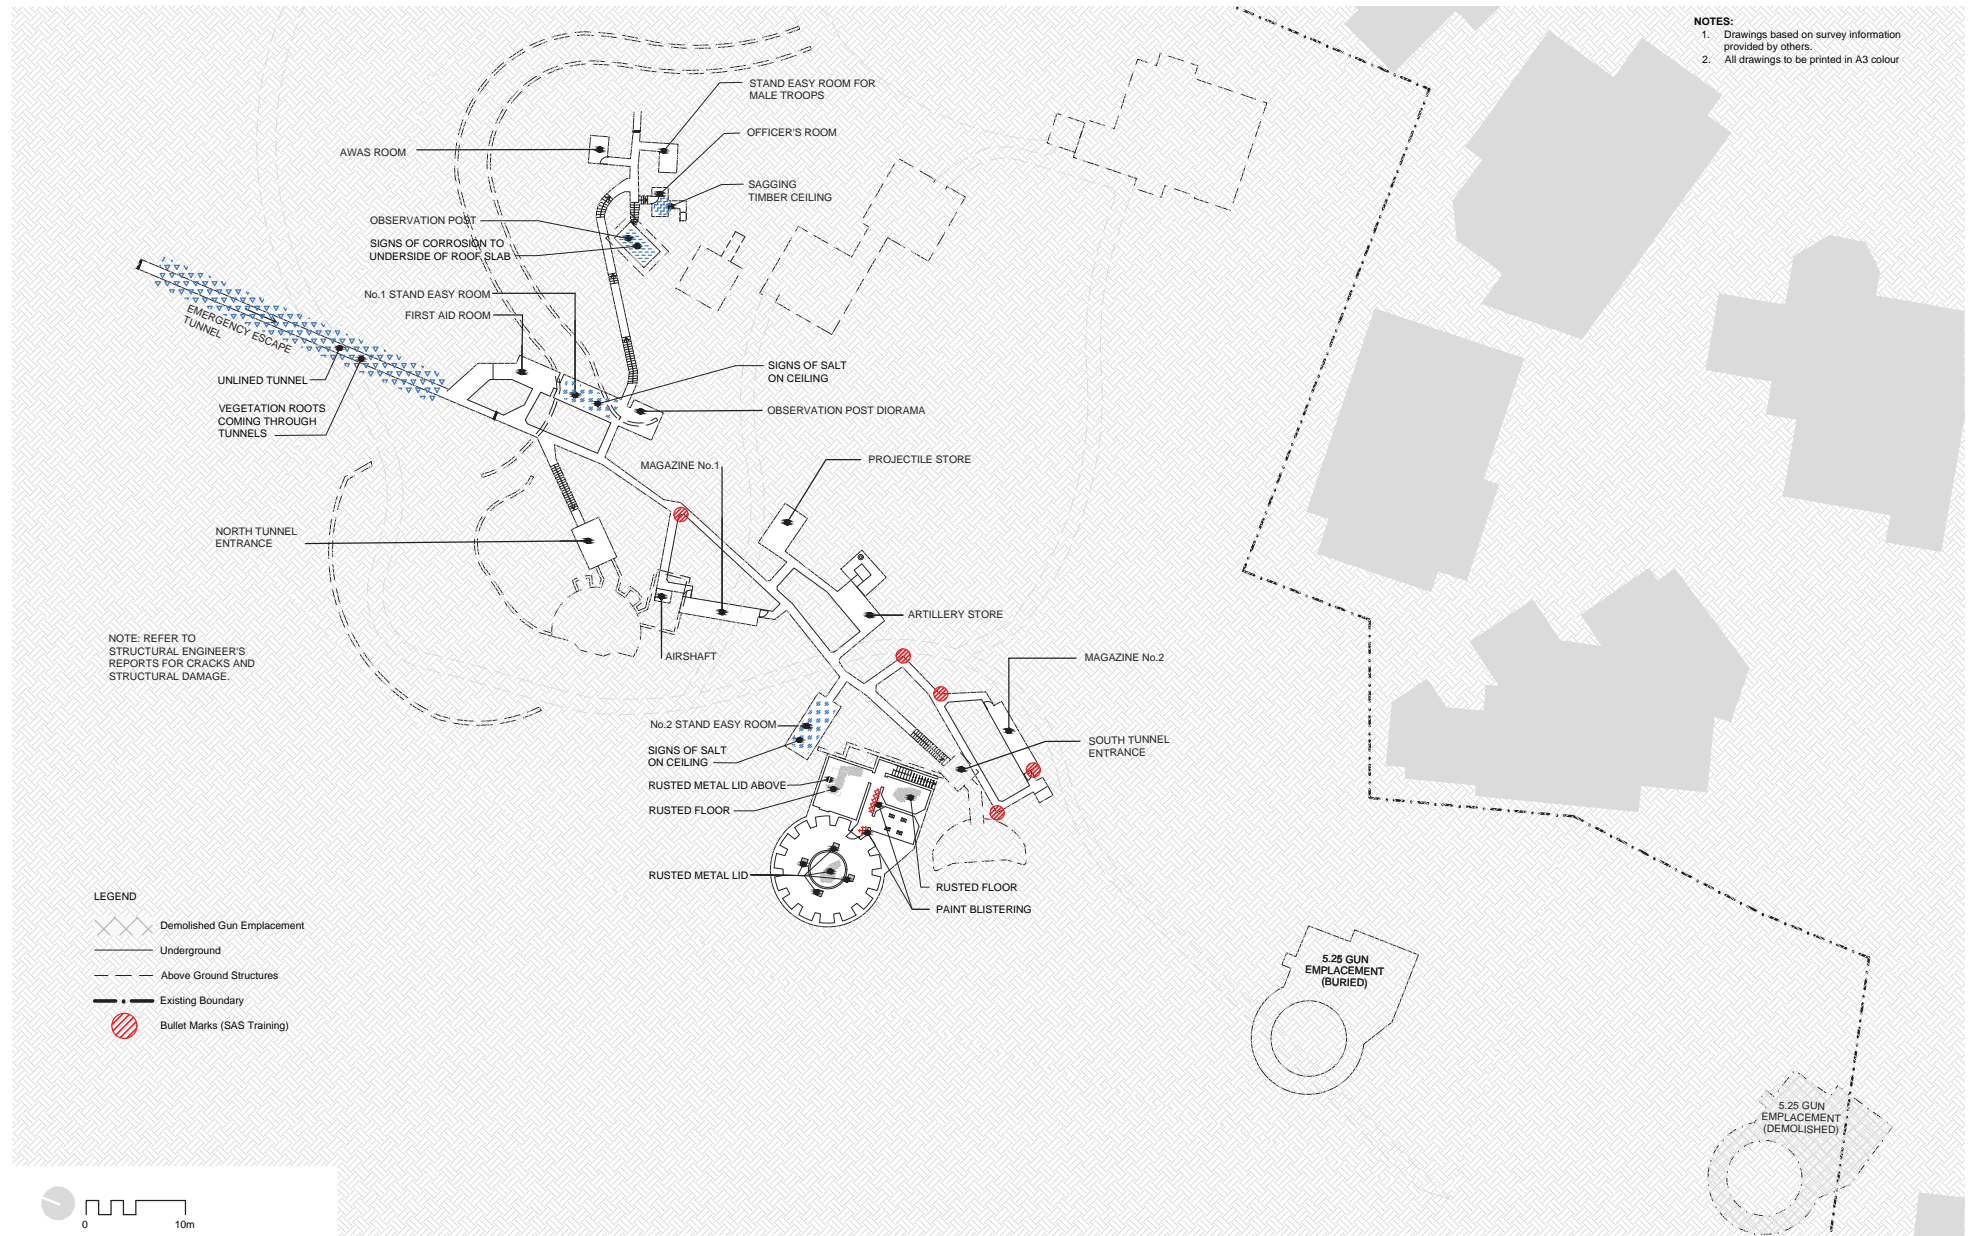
Underground Plan Overall Condition Plan (element, 2019)
